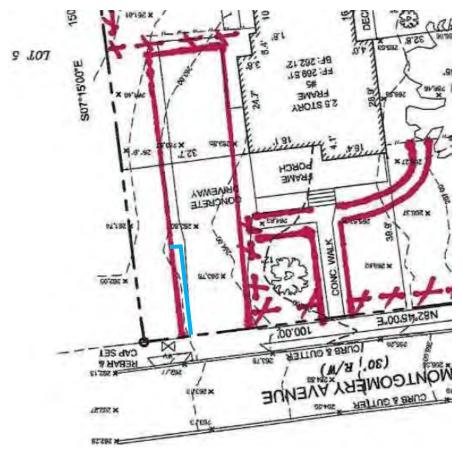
The proposed site plan showing the driveway and walkways (solid red lines) and staff-recommended modification (blue line).
